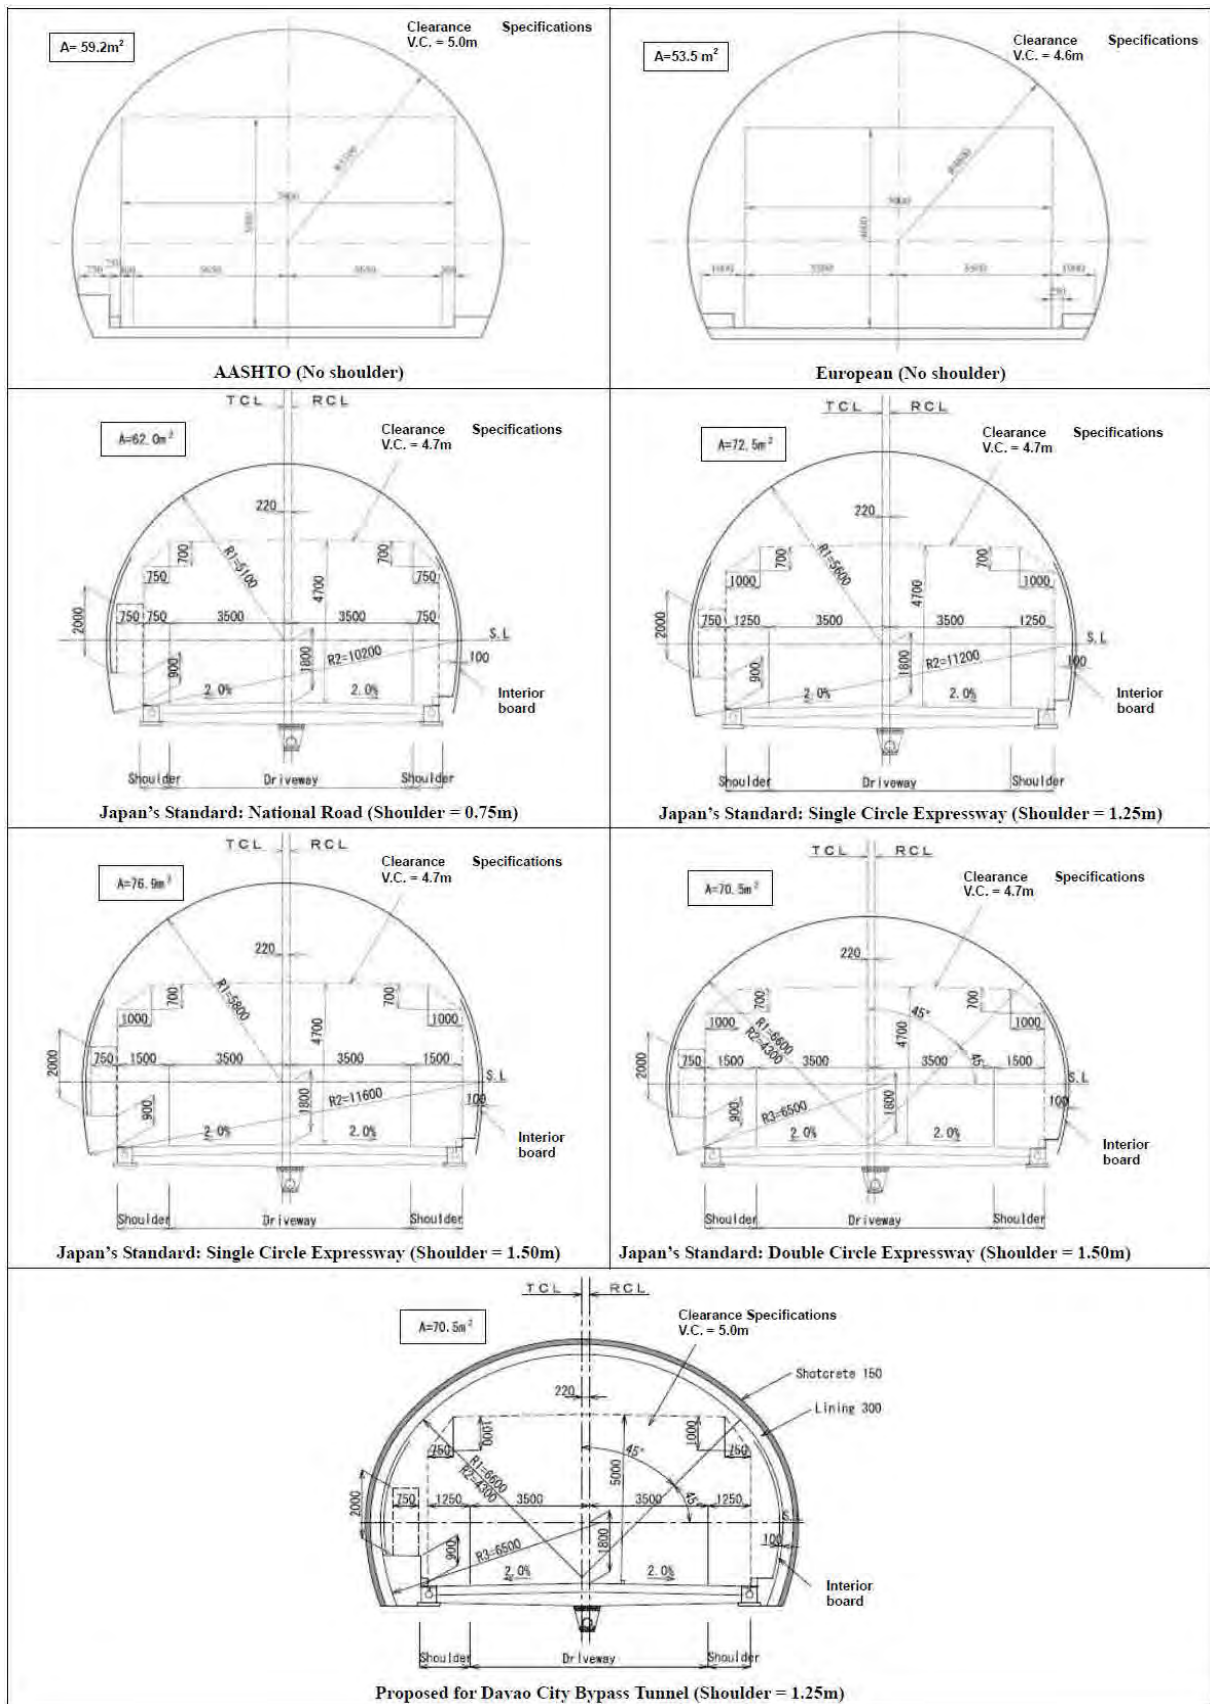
DIFFERENT KINDS OF TUNNEL CROSS SECTION
